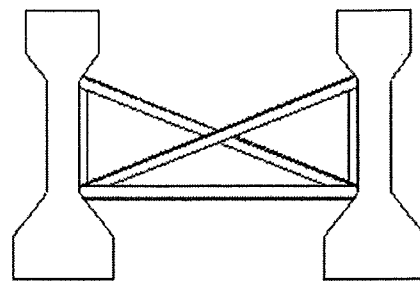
Steel Diaphragms between the Beams and the Cross-Section
